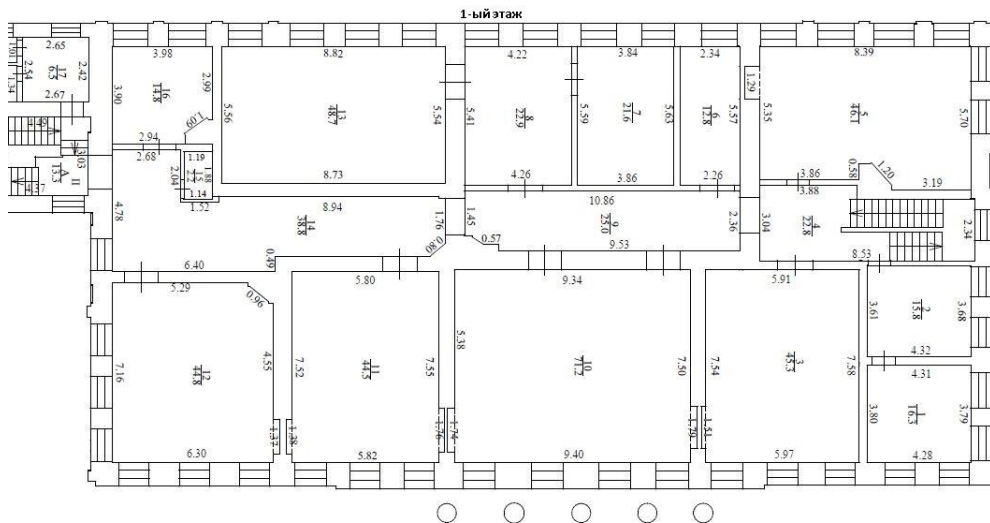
is a detailed floor plan of the 1st floor of the building. The plan shows various rooms with their dimensions in meters. Key areas include a large central hall (6.10m x 7.45m), a staircase (5.70m x 3.56m), and several smaller rooms and corridors. The plan is oriented with North at the top.
